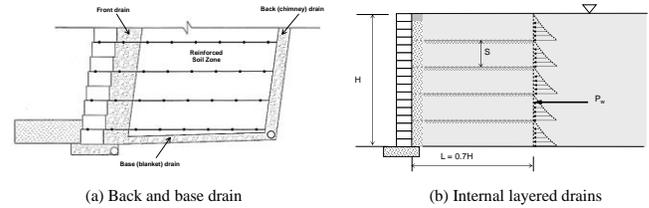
Alternative choices of removing layered water from reinforced soil zone of MSE walls.
